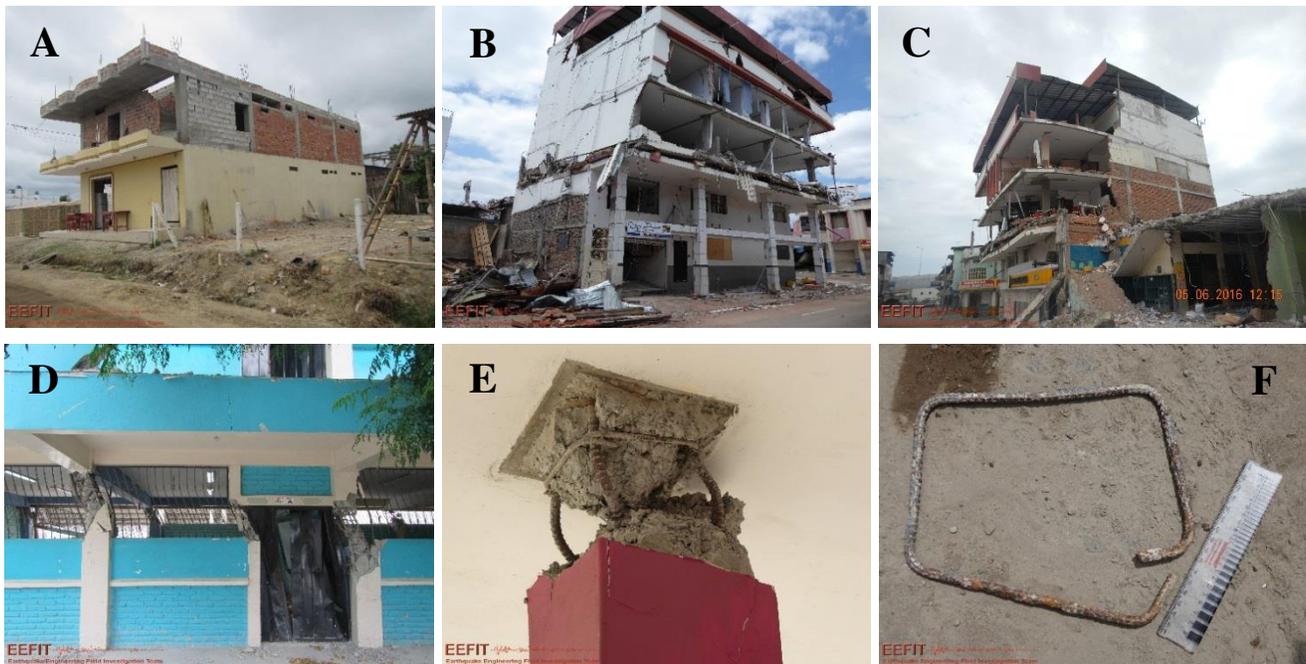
Two-storey building with columns' rebar left sticking out of roof for future extension (A). Weak/soft storey failure at upper level (B). Inadequate design/detailing of RC frame and infills (C). School building with short column failure (D). Column head failure showing insufficient and poor shear design and detailing (E). Column link with no 135°-bend (F).
